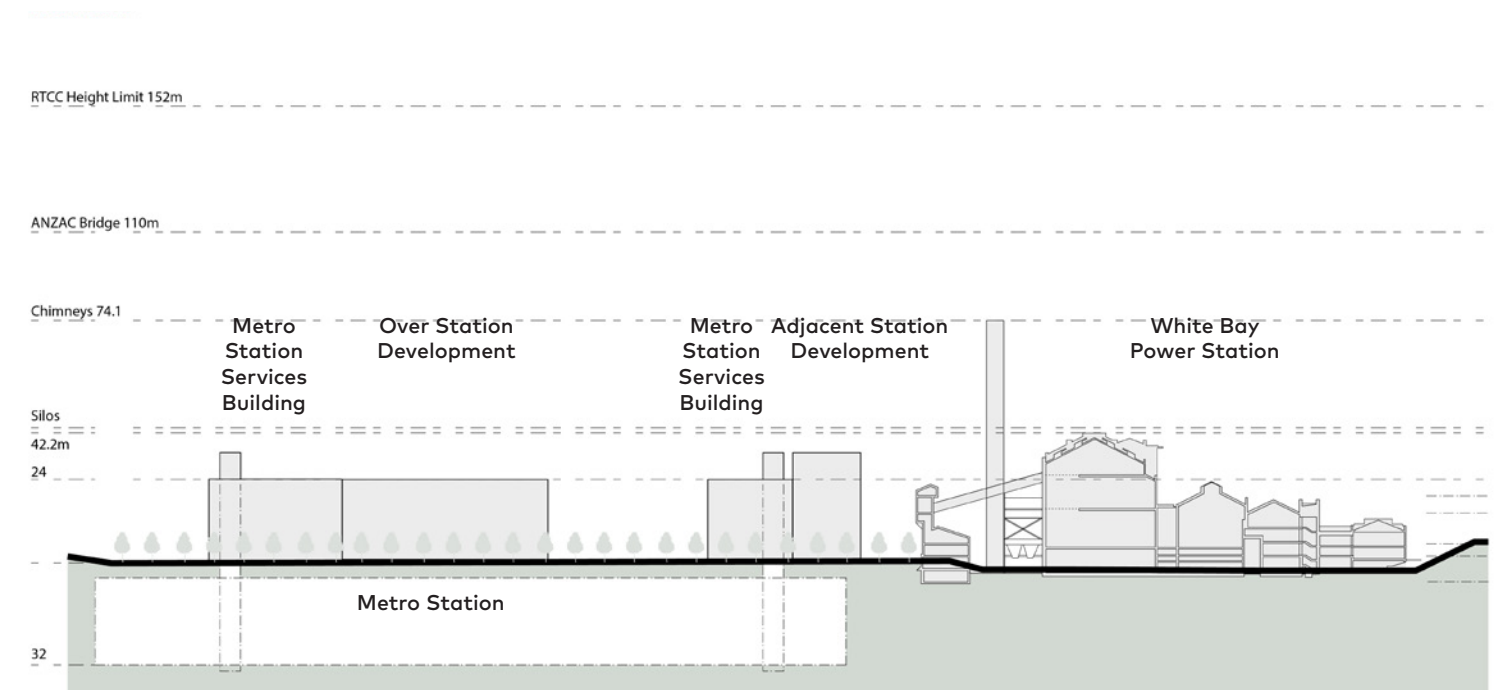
White Bay Power Station (and Metro) and Robert Street Sub-precincts section showing future Metro station and associated servicing
